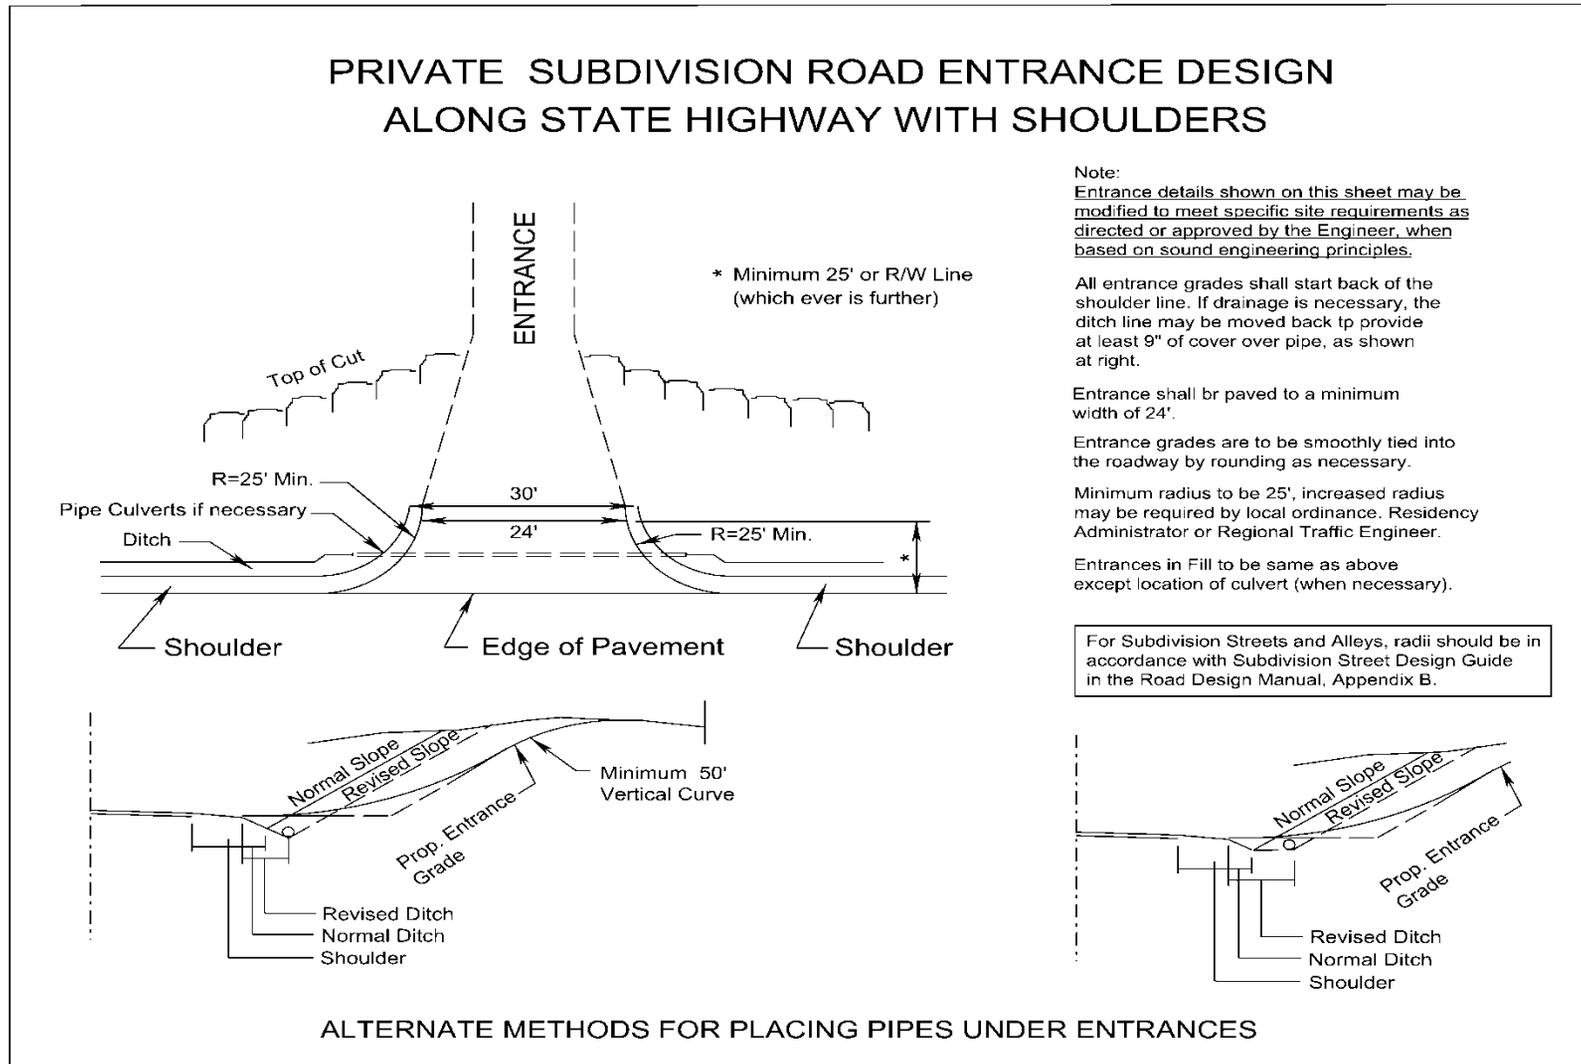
8 COMMERCIAL ENTRANCE DESIGN TO SERVE A PRIVATE SUBDIVISION ROAD / STREET
